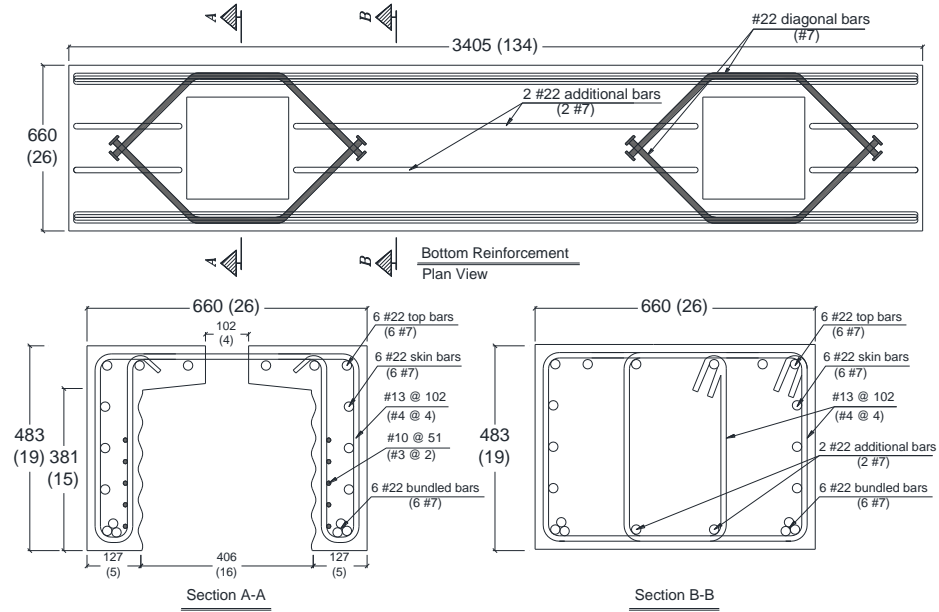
Details of the cap beam reinforcement of the two-column bent model [units are mm (in)]
